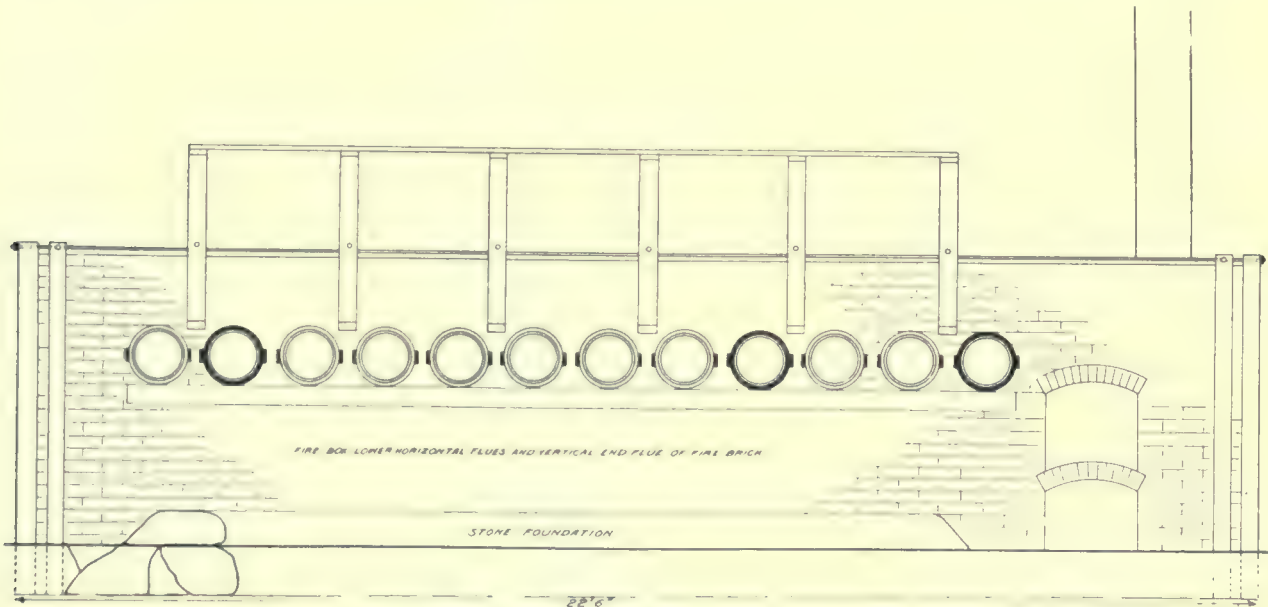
Retort Furnace for Quicksilver Ore. Front Elevation.
